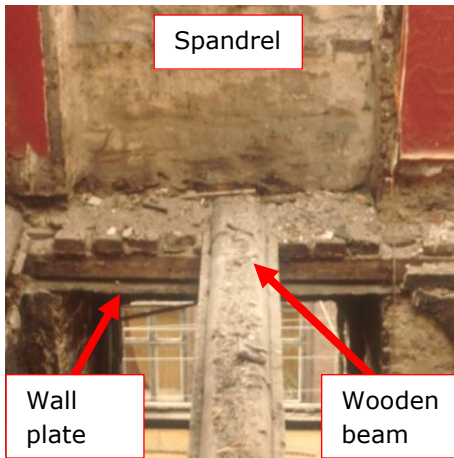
Wooden beam supported by a wall plate in between masonry columns, seen from top.
